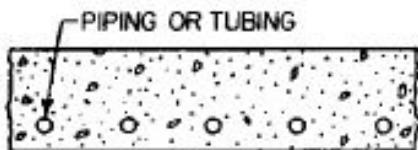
Pipe embedded in a concrete slab for radiant heating.
